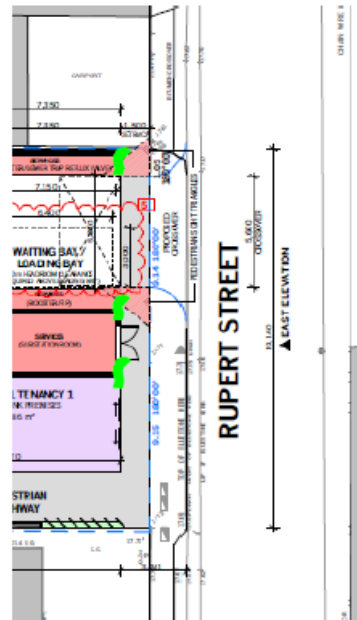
Part of ground floor plan identifying areas recommended by Council’s urban designer for planting in green.
